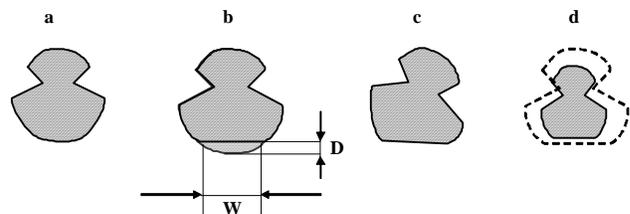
New contact wire cross-section (a) and possible contact wire defects: standard worn-out wire (b), "rotated wire" defect (c), "neck wire" defect (d).
